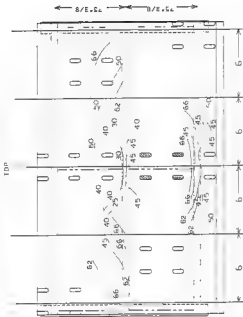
Top Cracking Pattern (Second Bridge - Test No 3)
